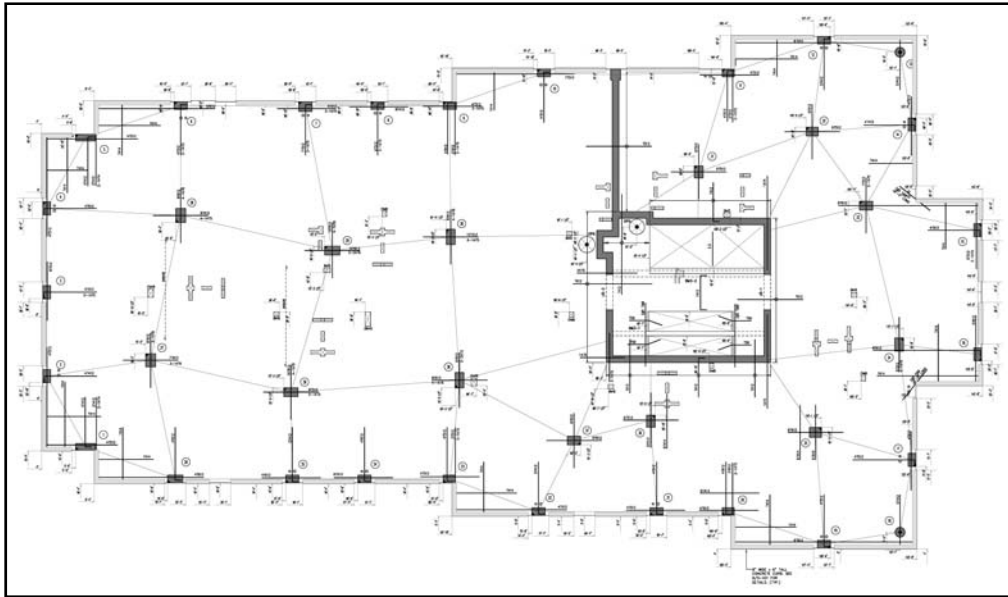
Typical floor plan for Roosevelt Island Southtown Building No. 5
